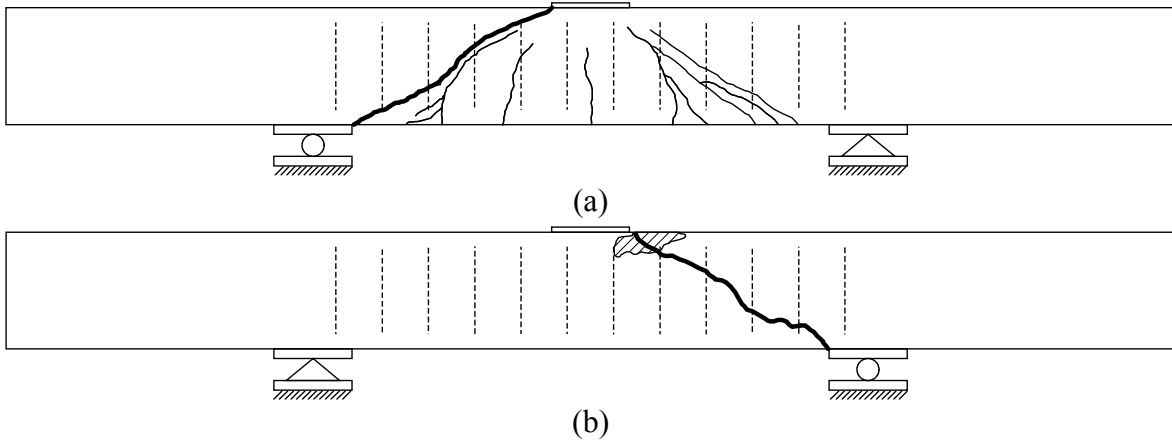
Observed damage in specimen P2S1, (a) front side, (b) back side
